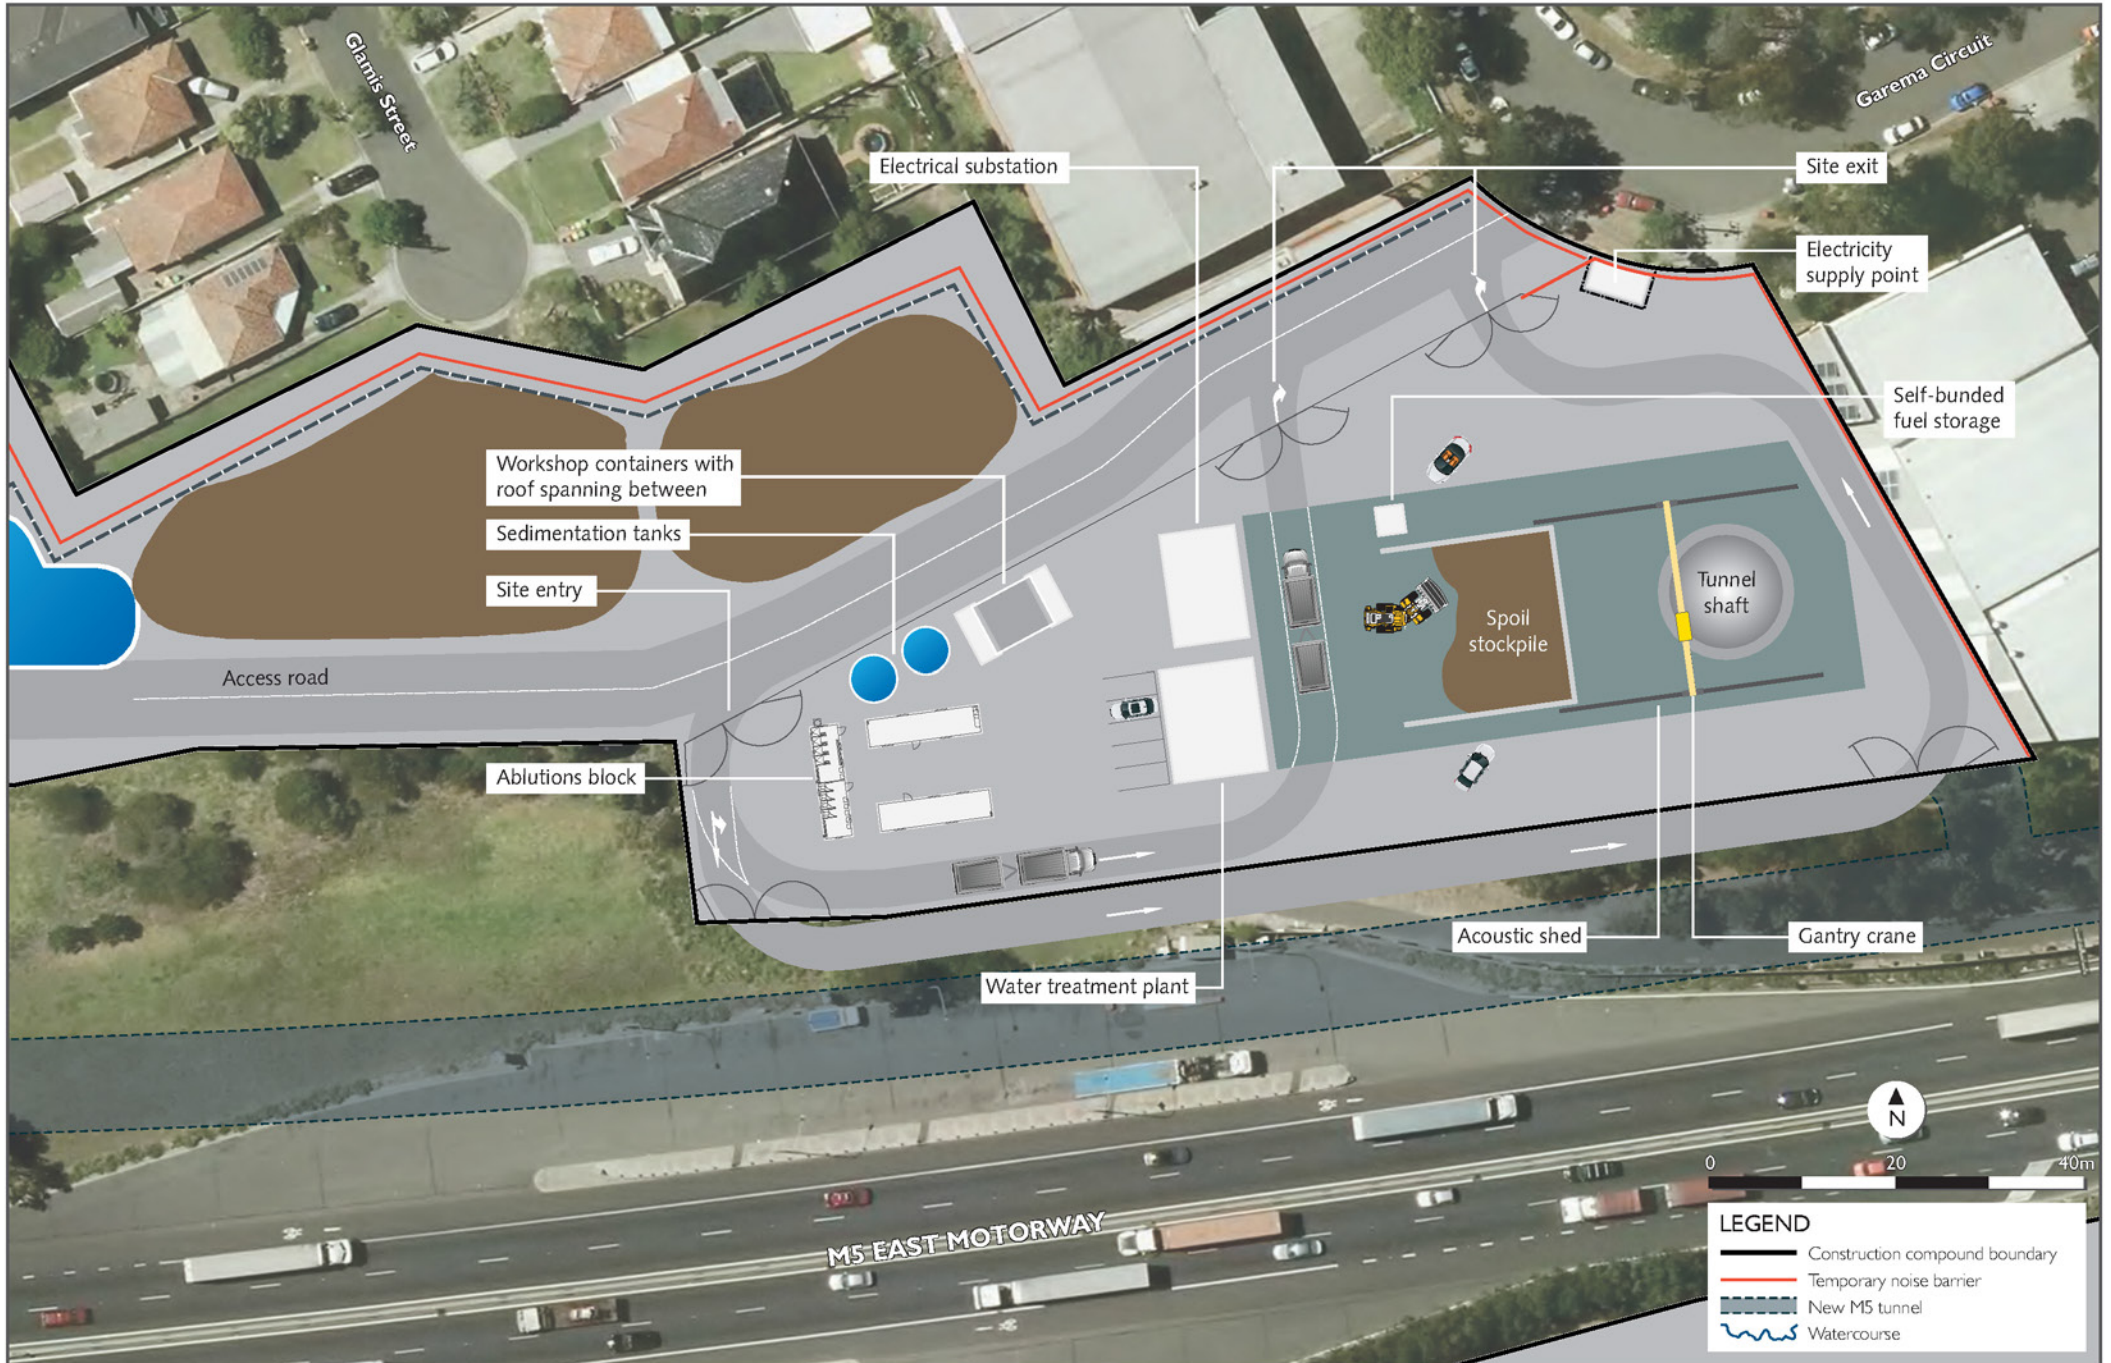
Kingsgrove North construction compound (C1) - tunnelling support layout
